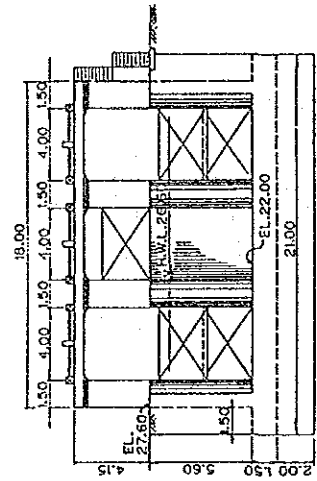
Proposed Plan of Large Scale Intake (Hassan Wasef Intake)
